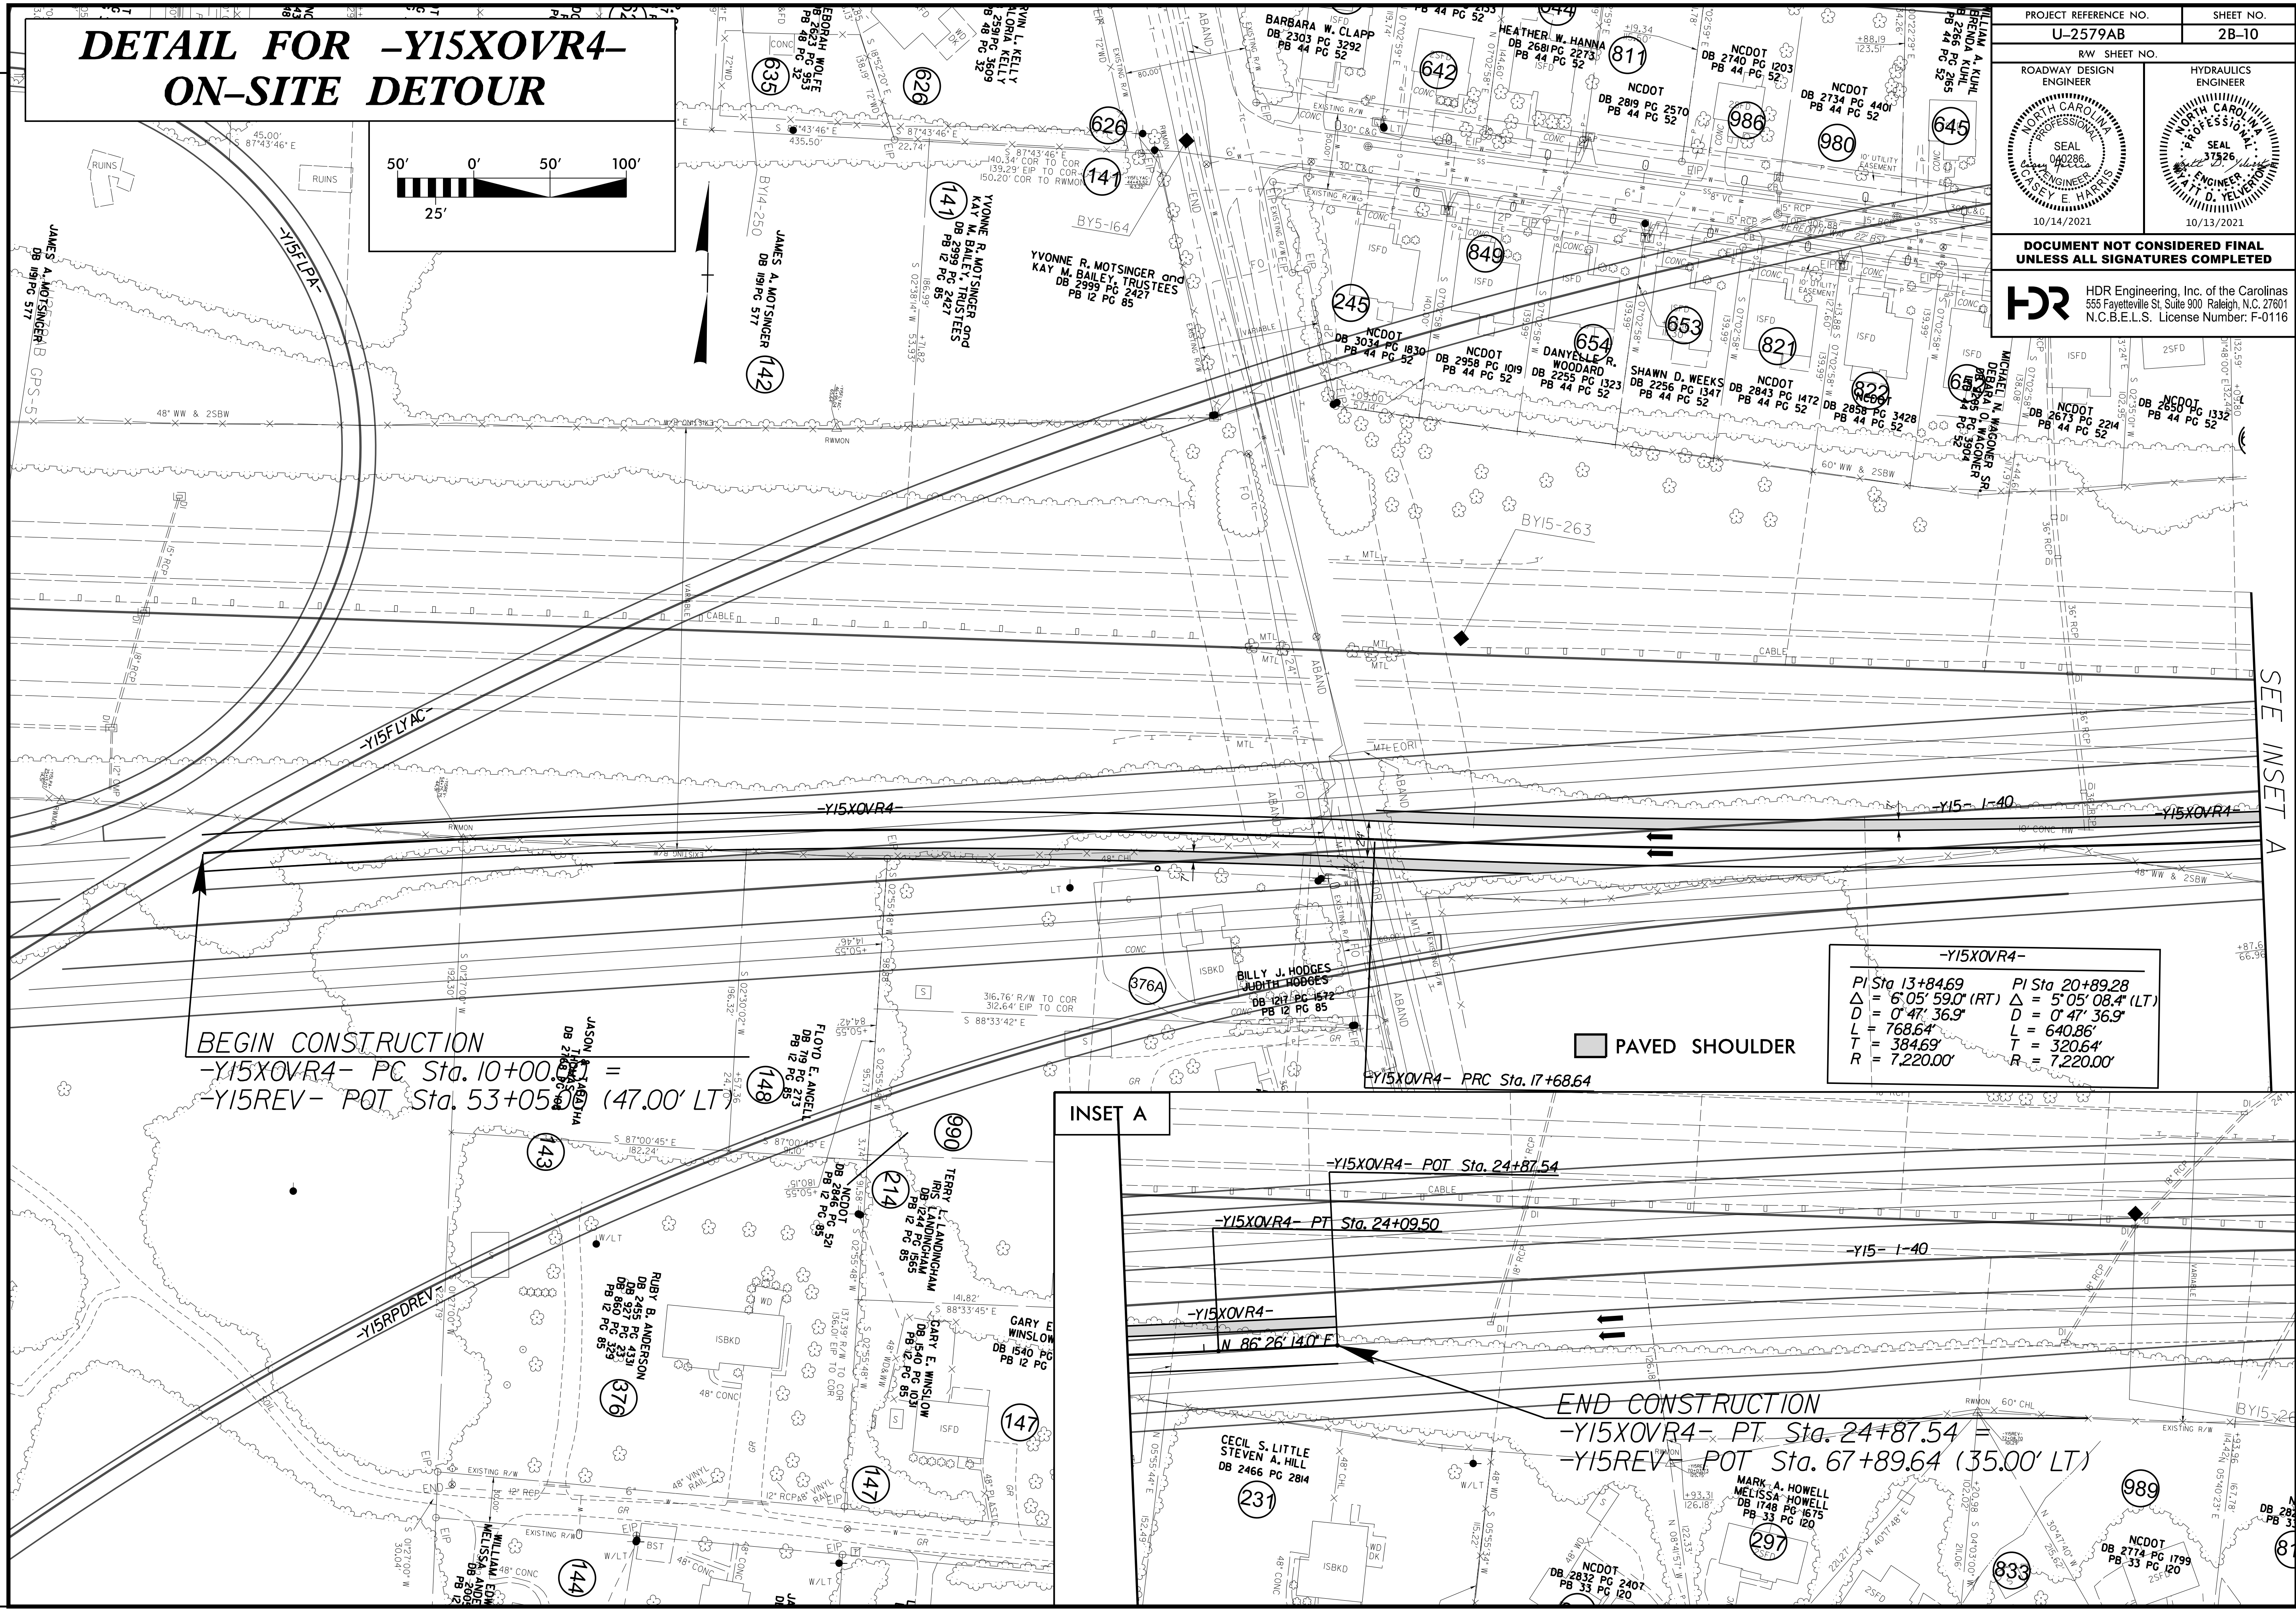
XOVR4- ON-SITE DETOUR
